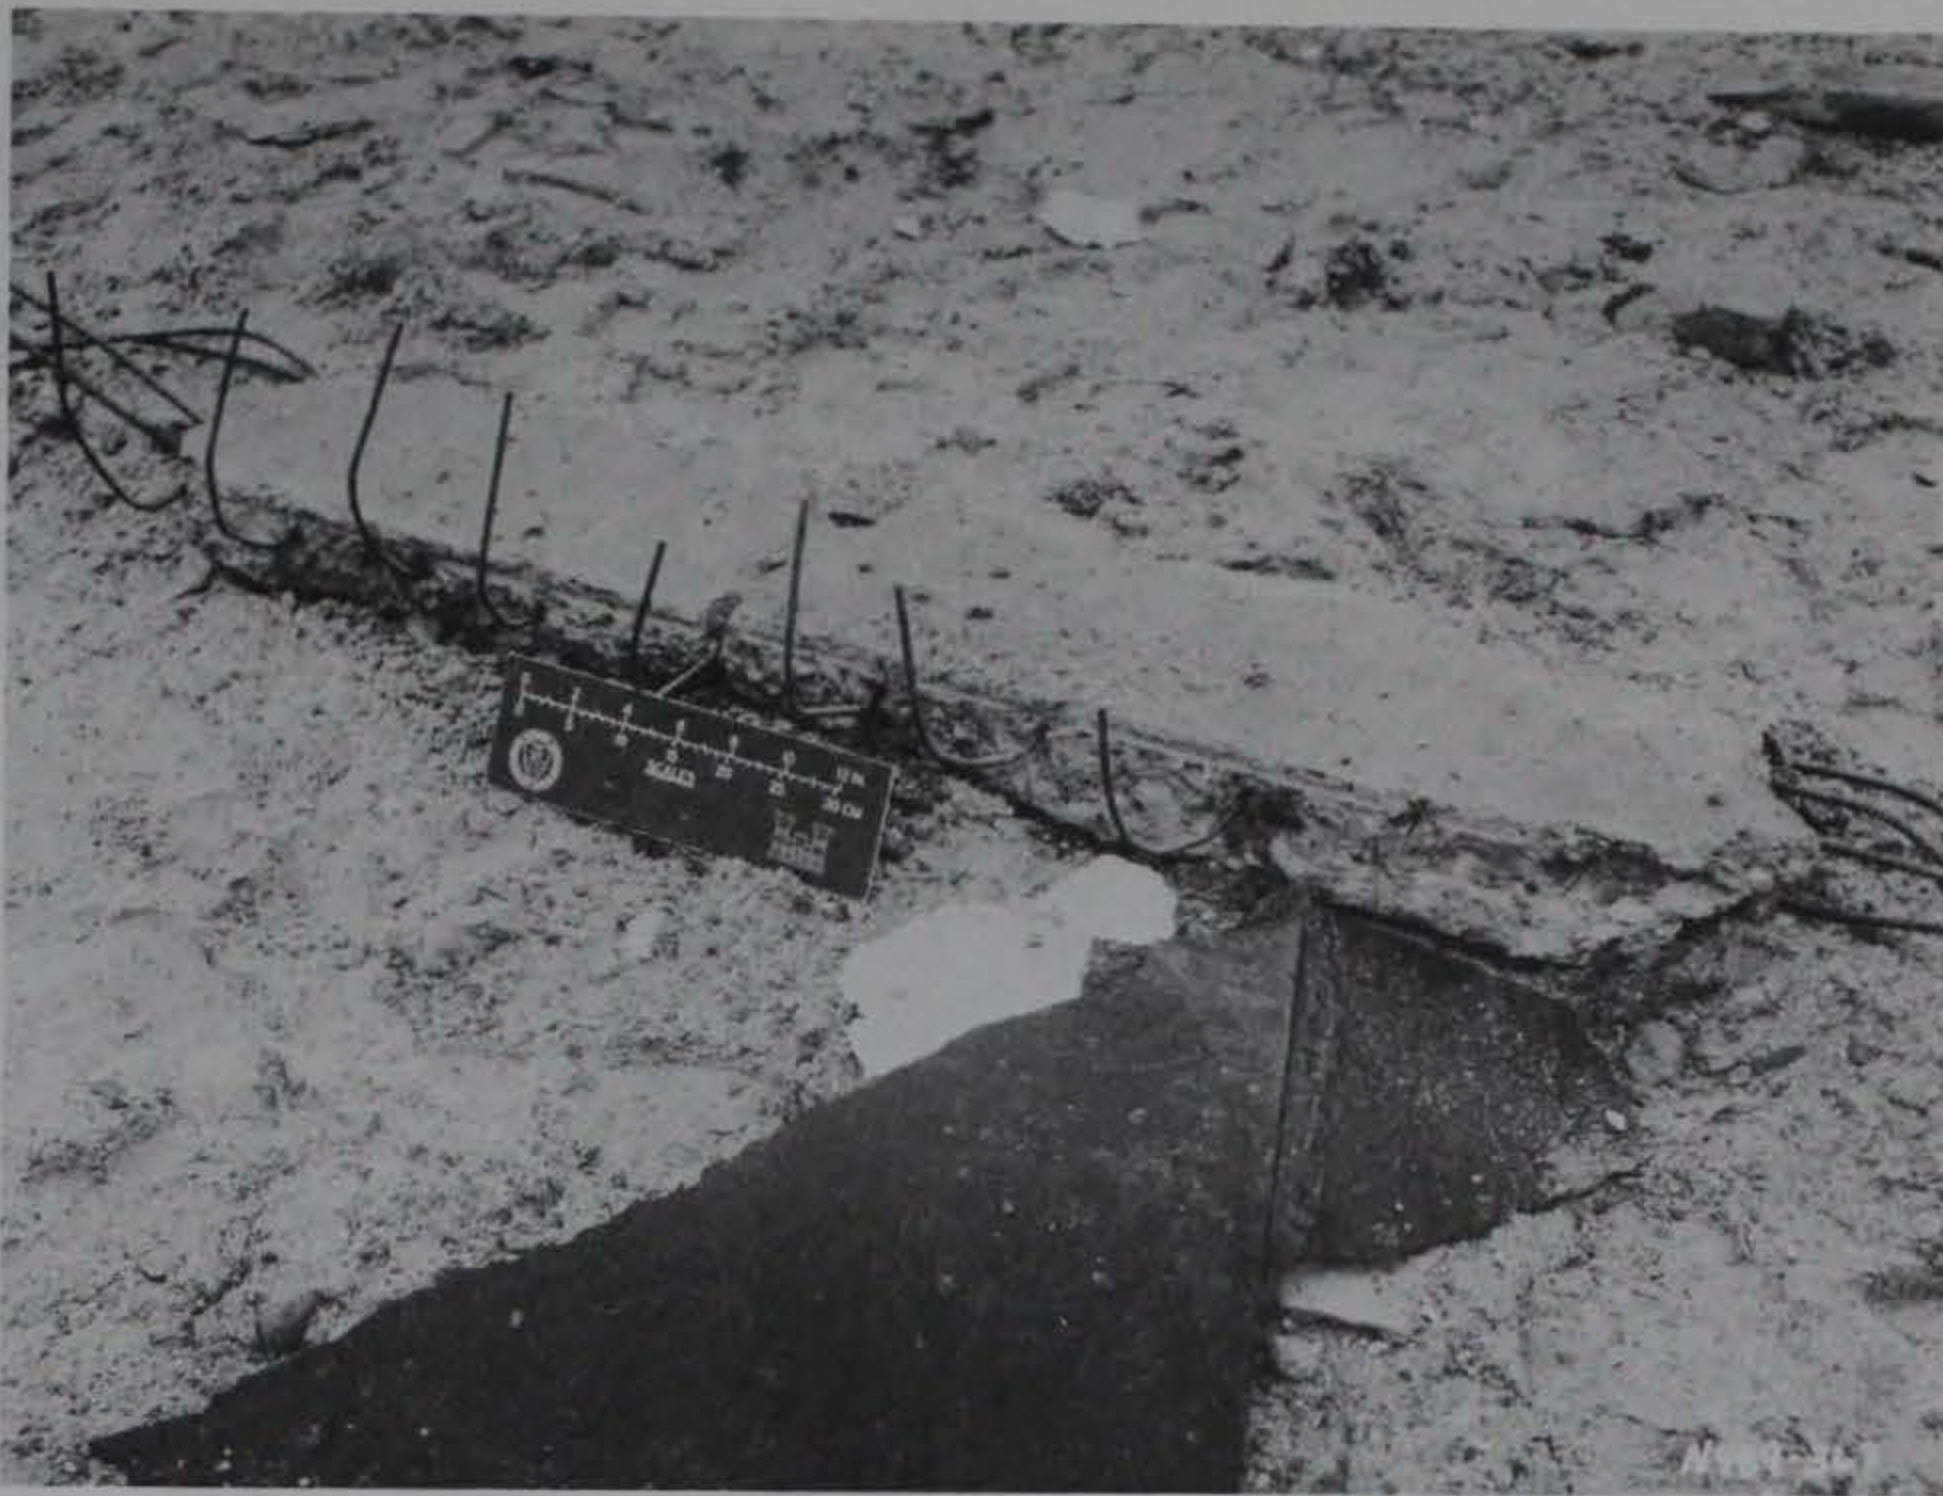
Damage to upper part of donor bay air-lock blast door bulkhead.
